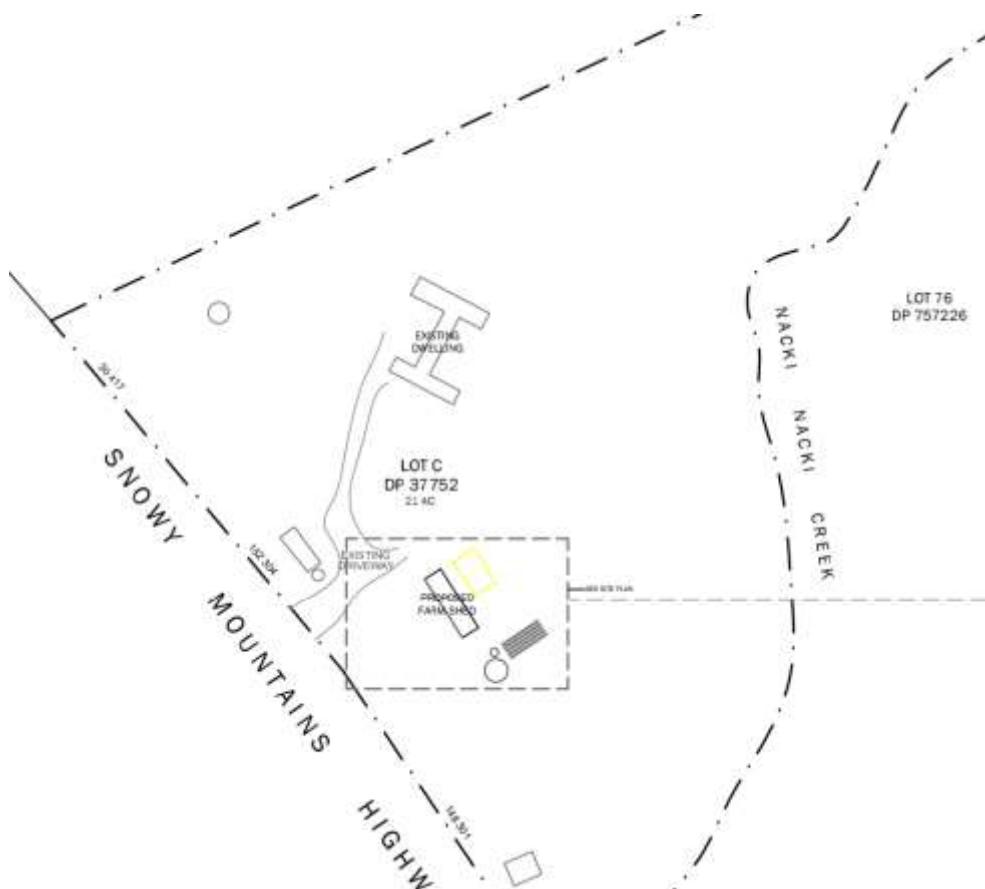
Proposed location of new farm building (Source: extract submitted plans)
